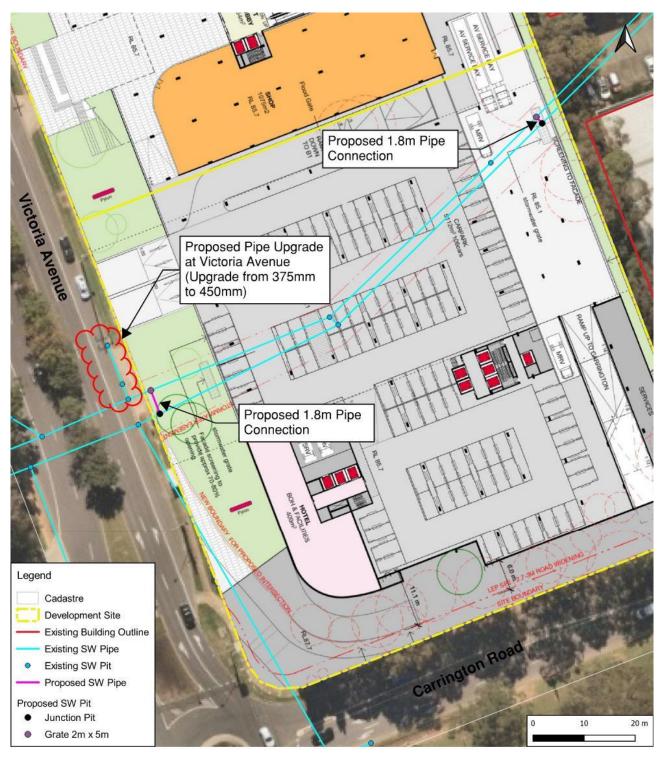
Proposed Pipe upgrade at Victoria Avenue
